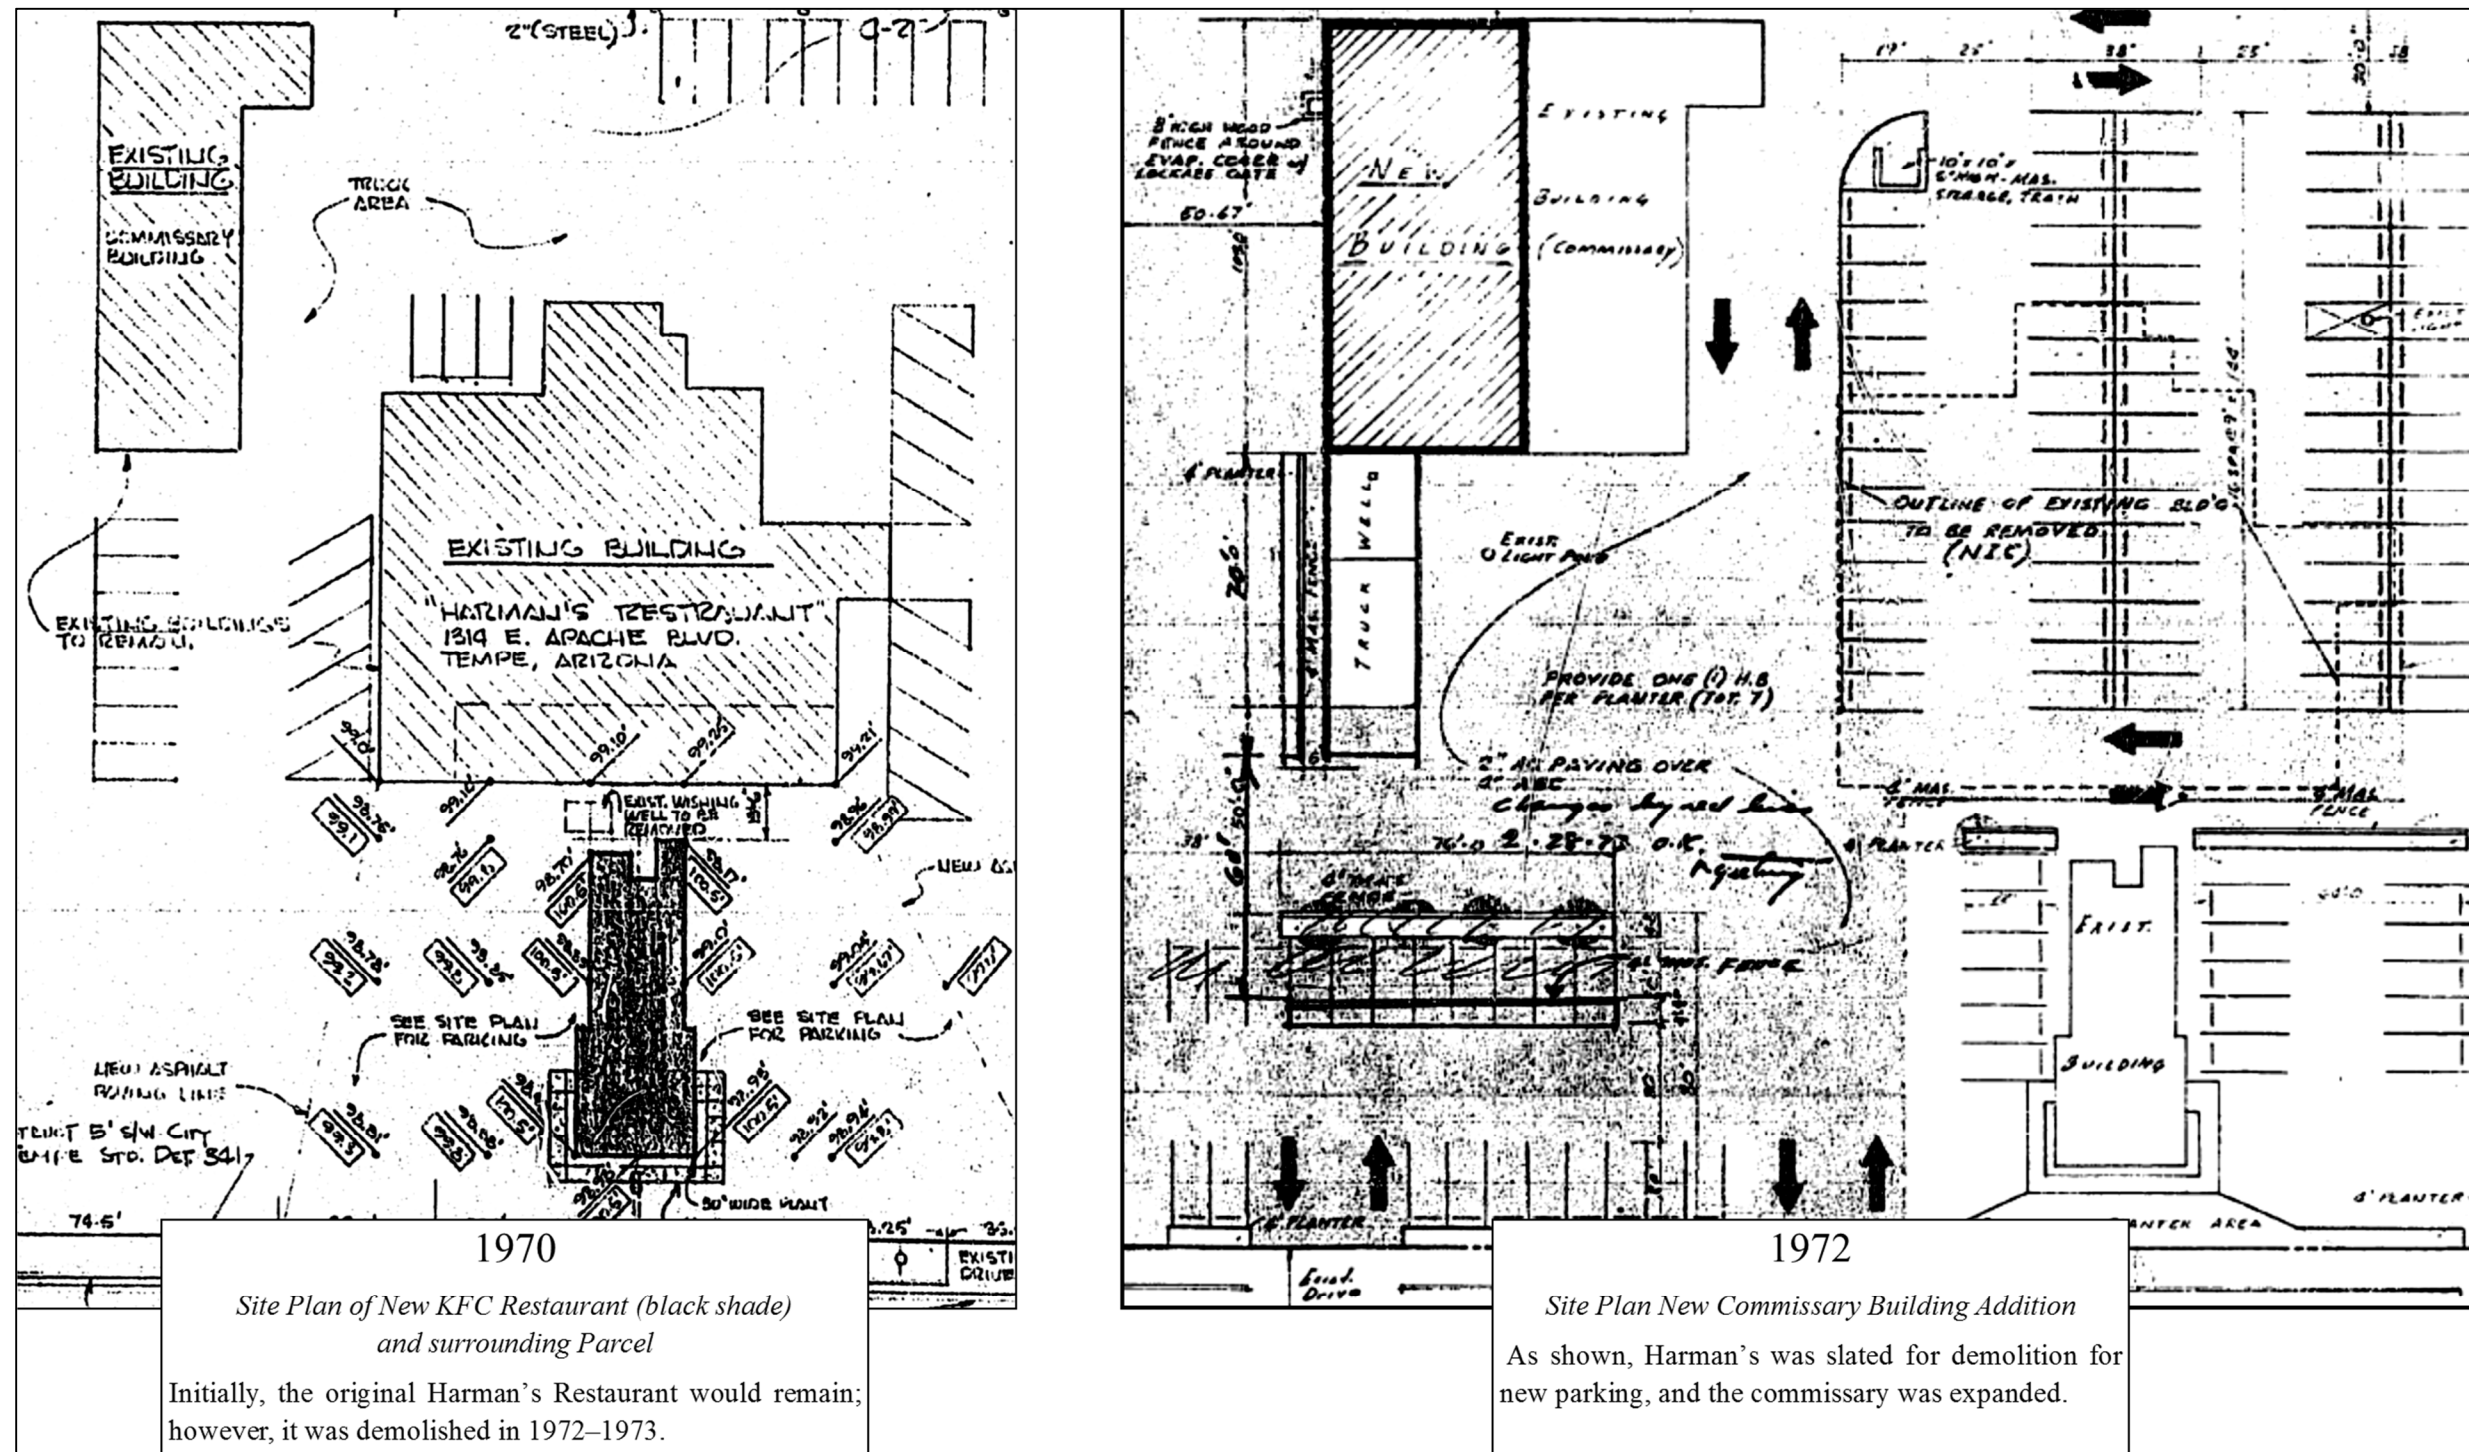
Collage of site plans prepared in 1970 and 1972 on the Dorsey Parcels at 1310 E Apache Boulevard (APNs 132-62-148 and 132-62-149) (Plans courtesy of City of Tempe HPO).
